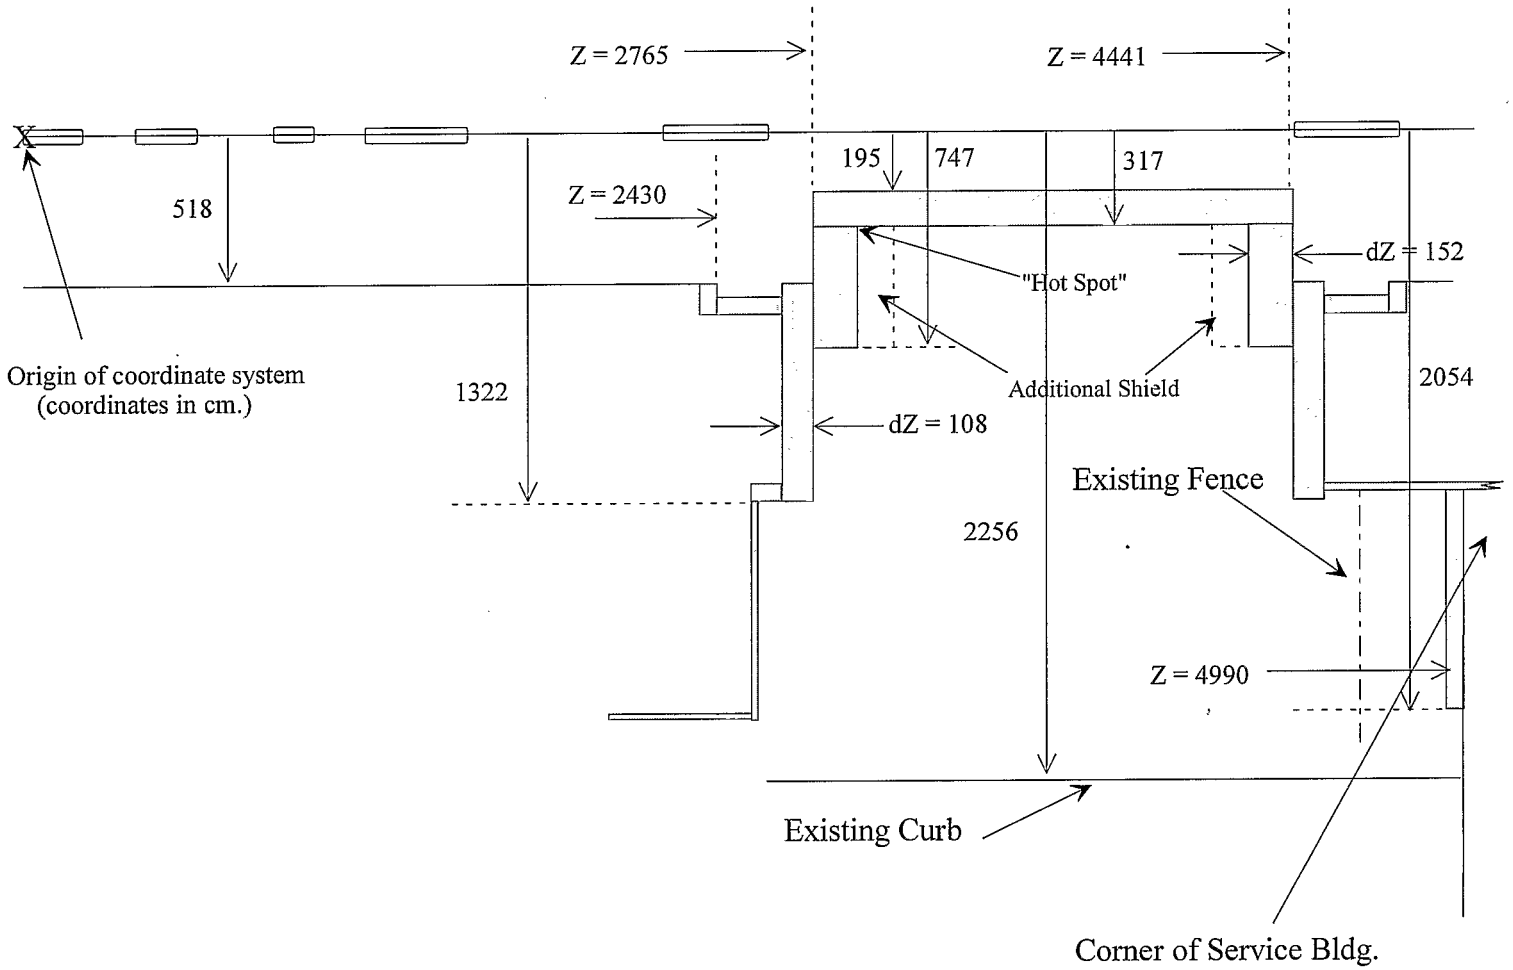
Twelve O'clock Area: Ring Center Side at Beam Elevation
